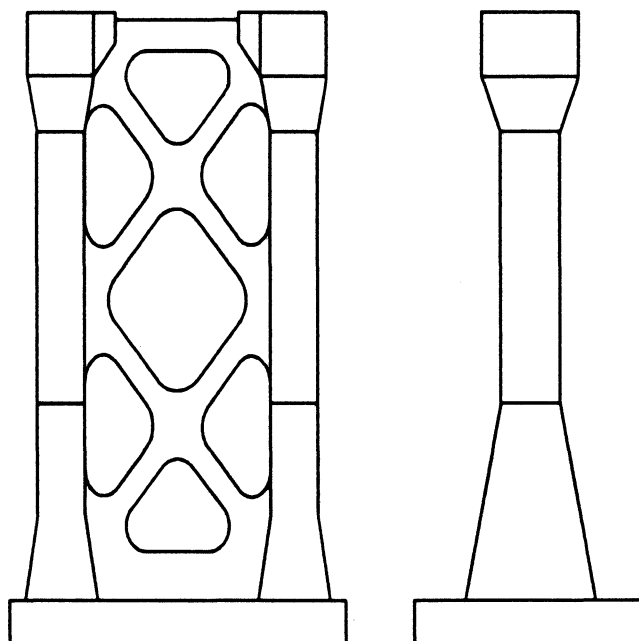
Appearance of pier after steel is encased in concrete (adapted from Maroney, 1996)
